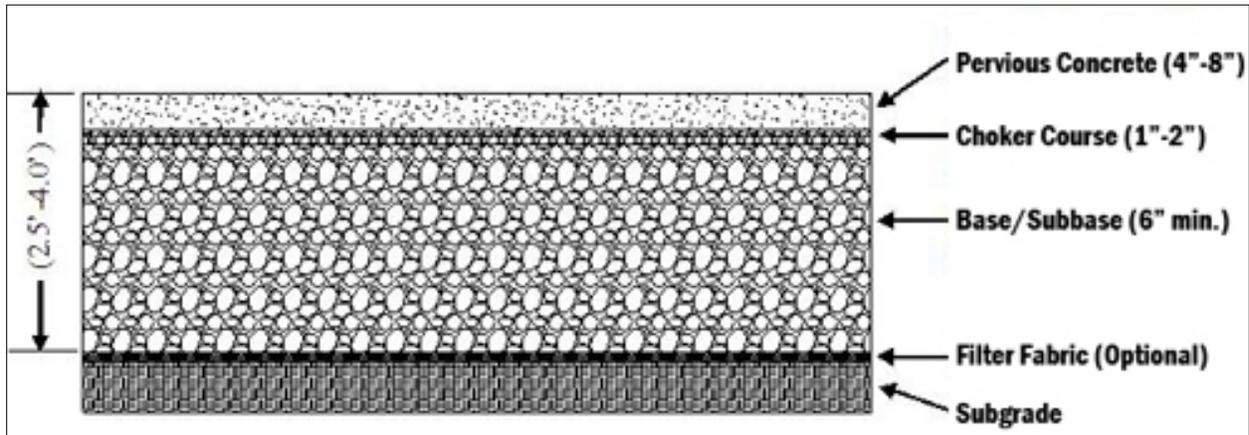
Typical pervious concrete pavement section (source: USEPA).
